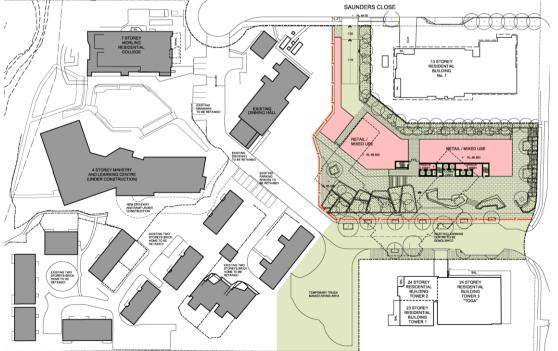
Scenario 4 – Construction of Building 1 with a quarter of the road constructed.
